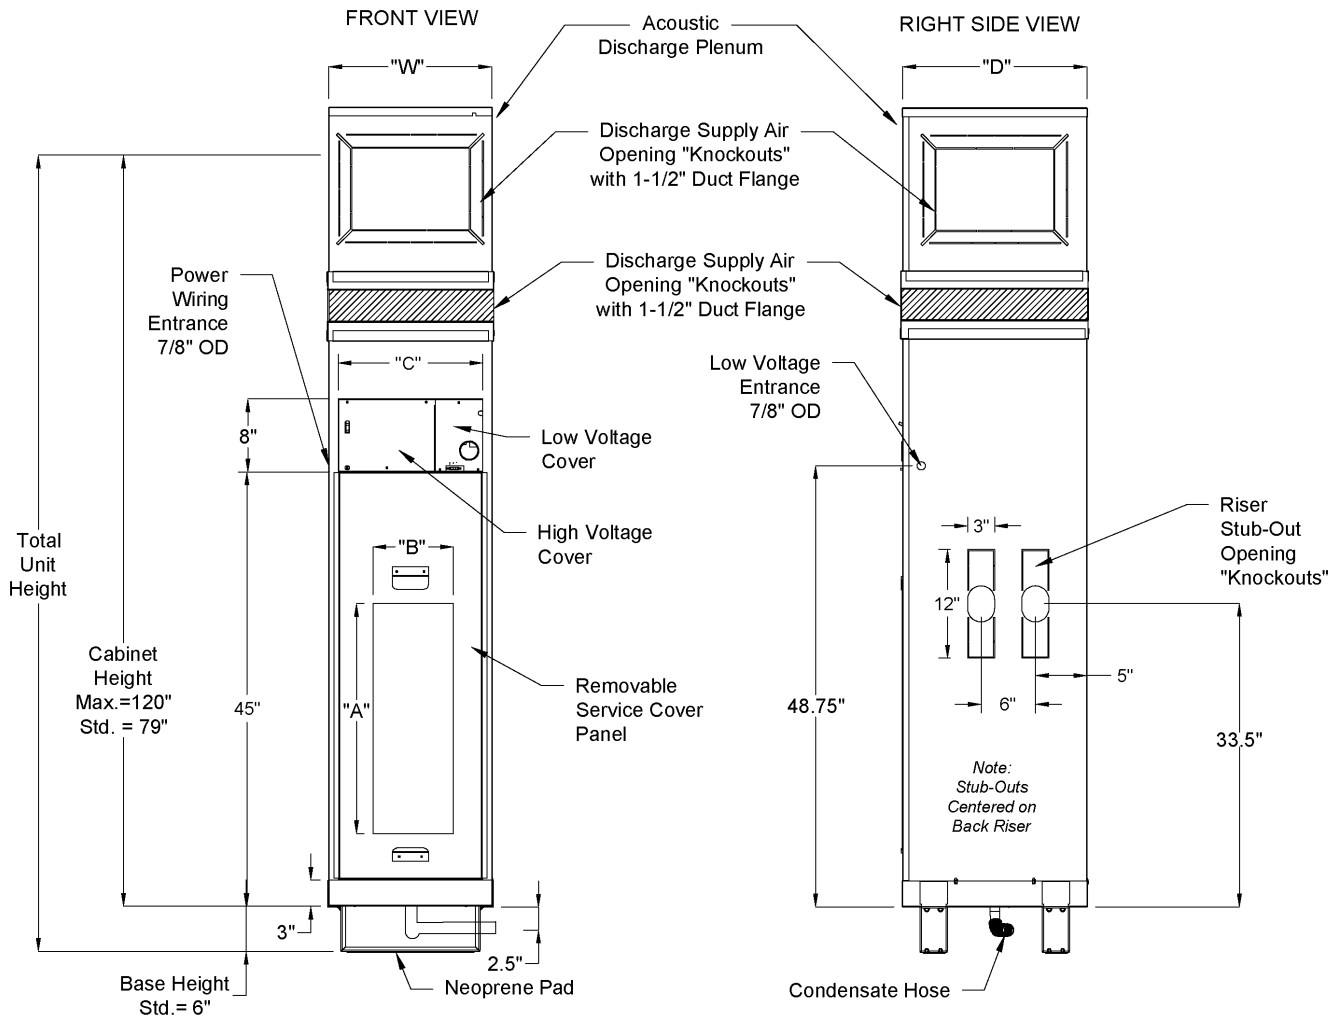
Gold Series w/ Acoustic Plenum Dimensional Drawing
